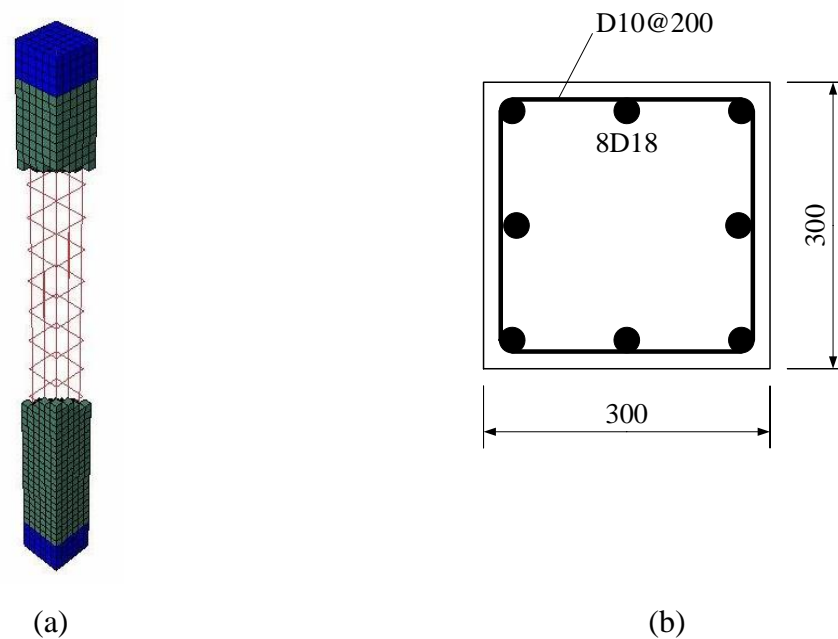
Reinforced concrete column (a) Finite element view and (b) cross section
